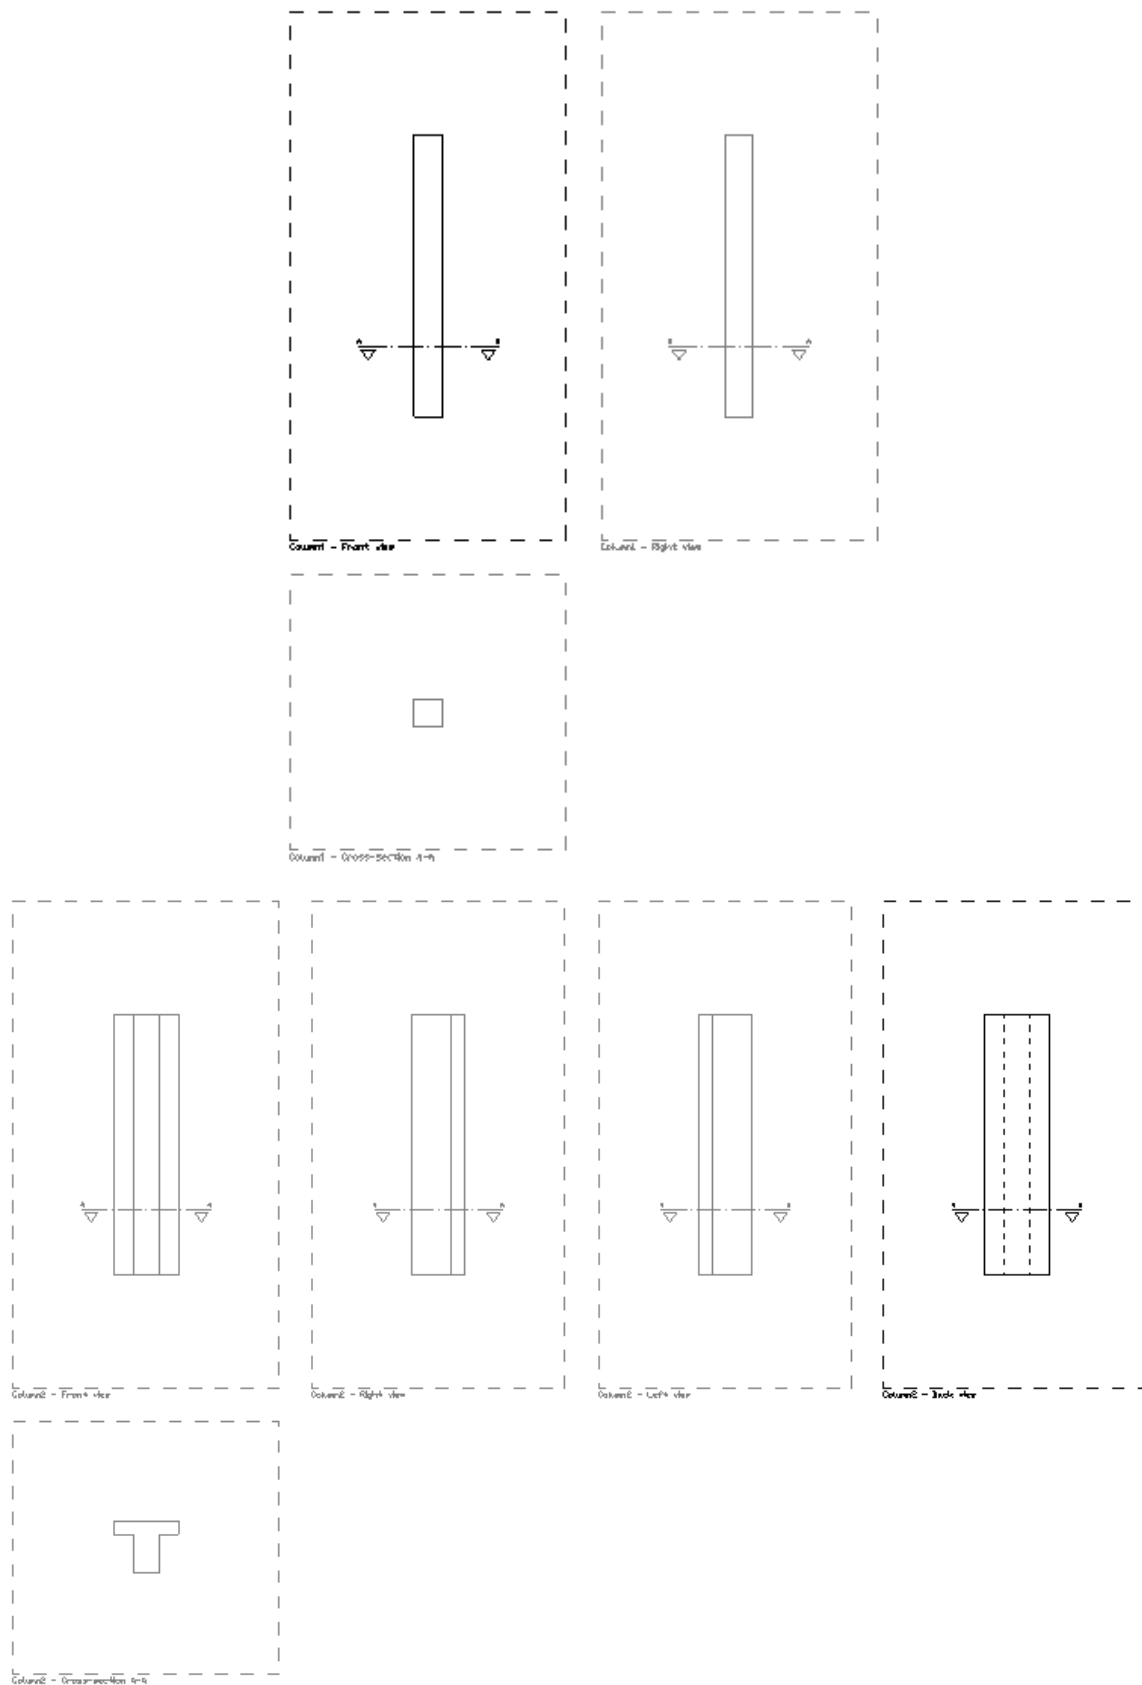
Two Views and one Section of the rectangular column, and four Views and one Section of T-section column.
